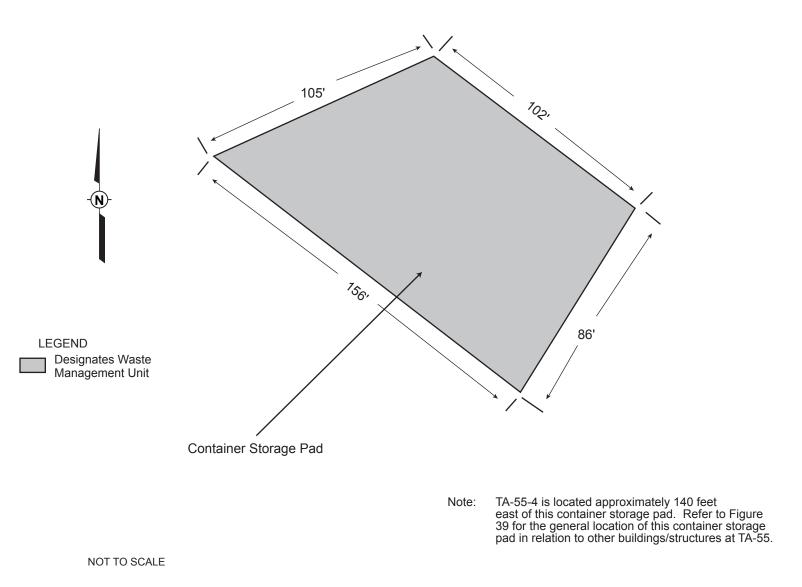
Technical Area (TA)-55, Building 4, Outdoor Container Storage Pad
